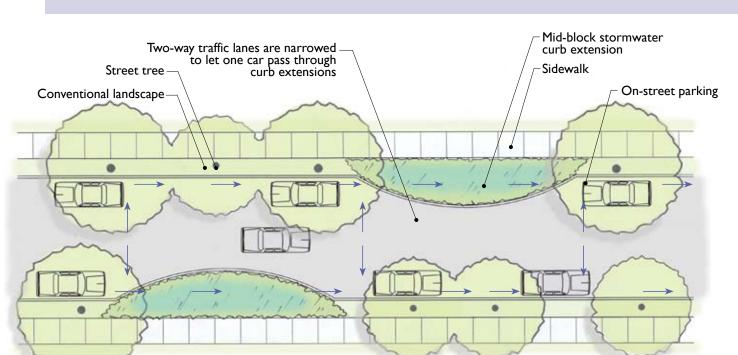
Mid-Block Stormwater Curb Extension (Staggered Layout)-Plan
